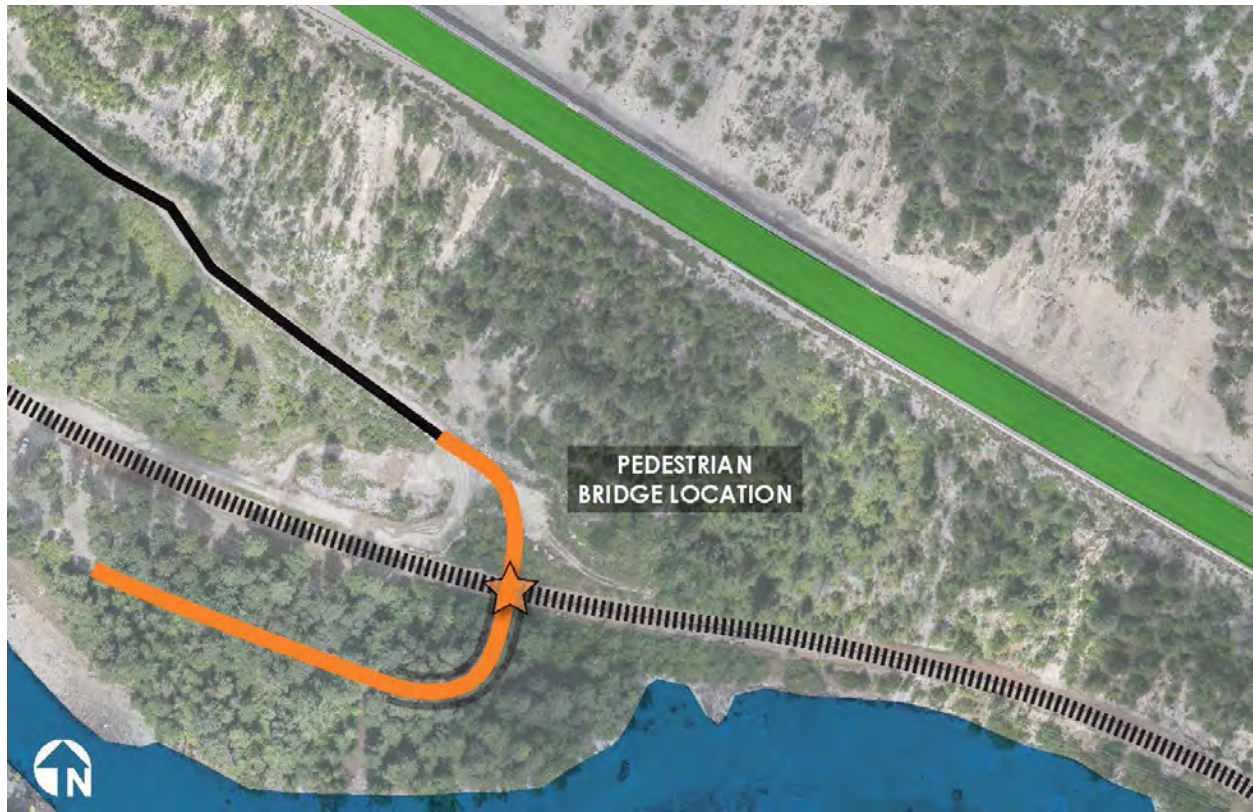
Pedestrian Bridge Over Tracks Alignment
